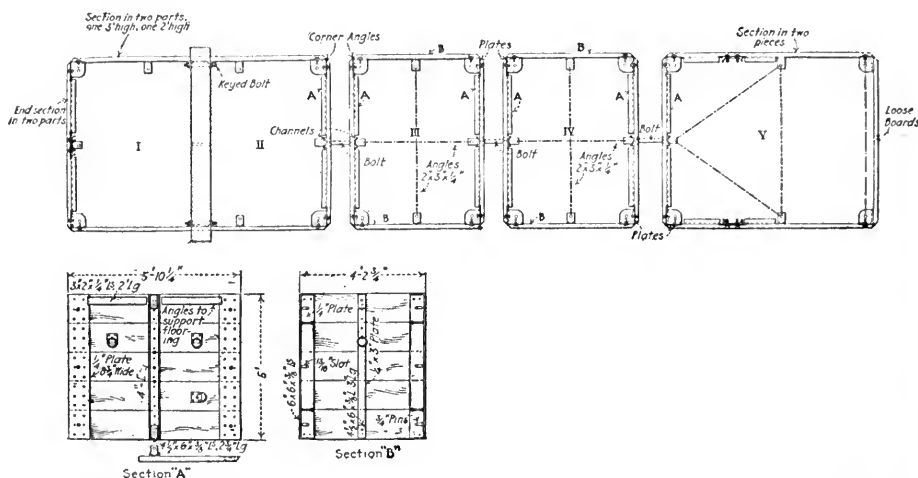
ARRANGEMENT OF THE FORMS IN THE SHAFT AND DETAILS OF TWO SECTIONS.
